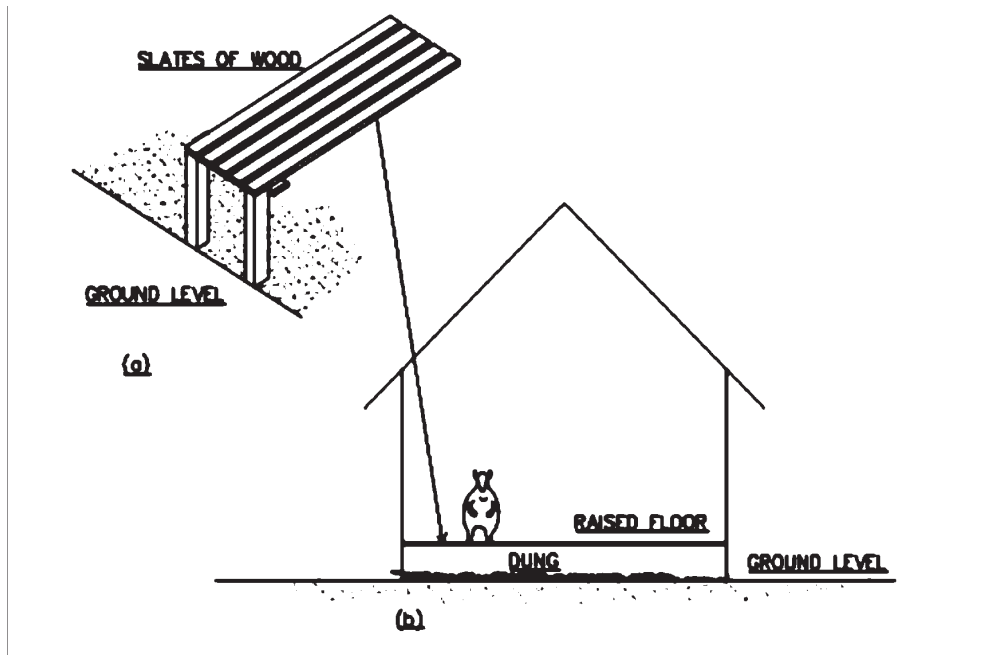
House showing a slated raised floor made of wood (Bamboo could be use in place of wood where it is available)
